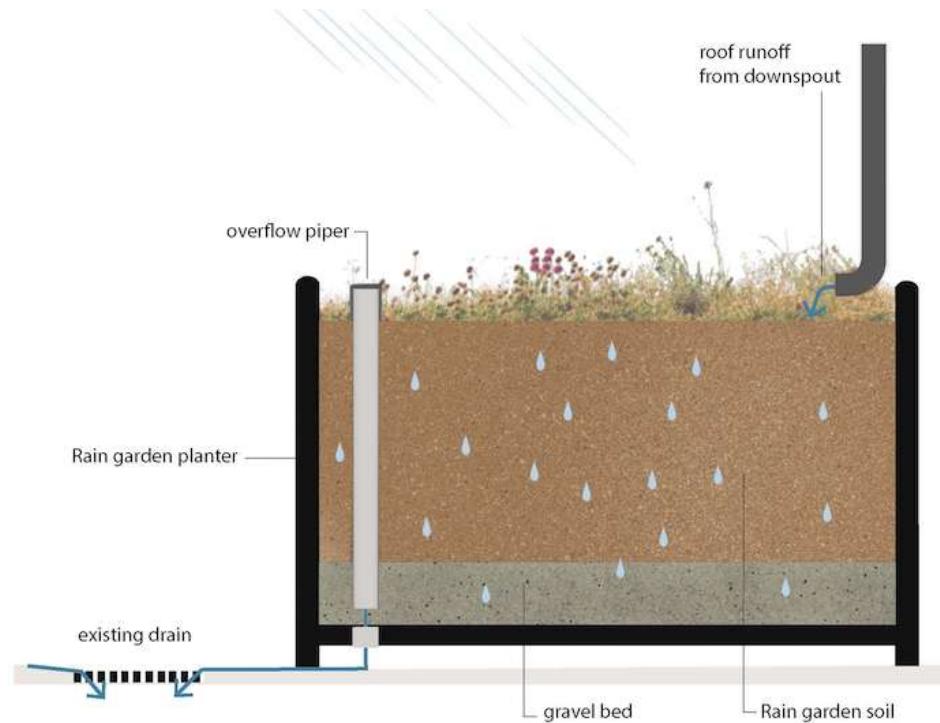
RAIN GARDEN RAISED PLANTER DETAIL USED FOR SURFACE WATER RUN-OFF FROM ROOF
